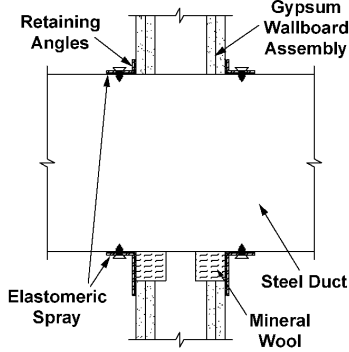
STEEL HVAC DUCT PENETRATIONS - GYPSUM WALLBOARD WALLS
